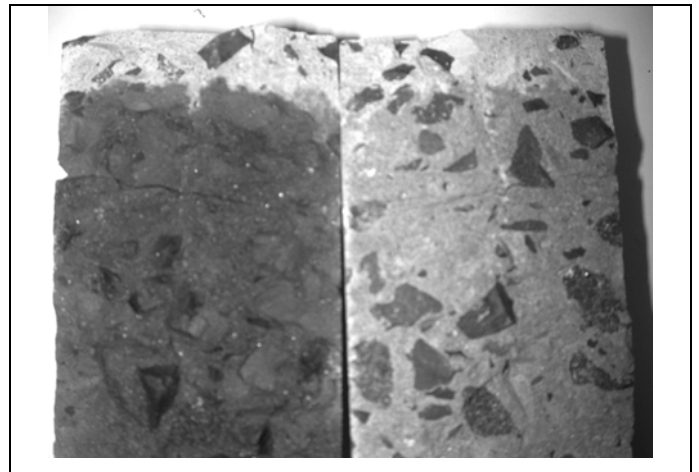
Specimens extracted from reinforced concrete beam showing carbonation behavior along the crack.
